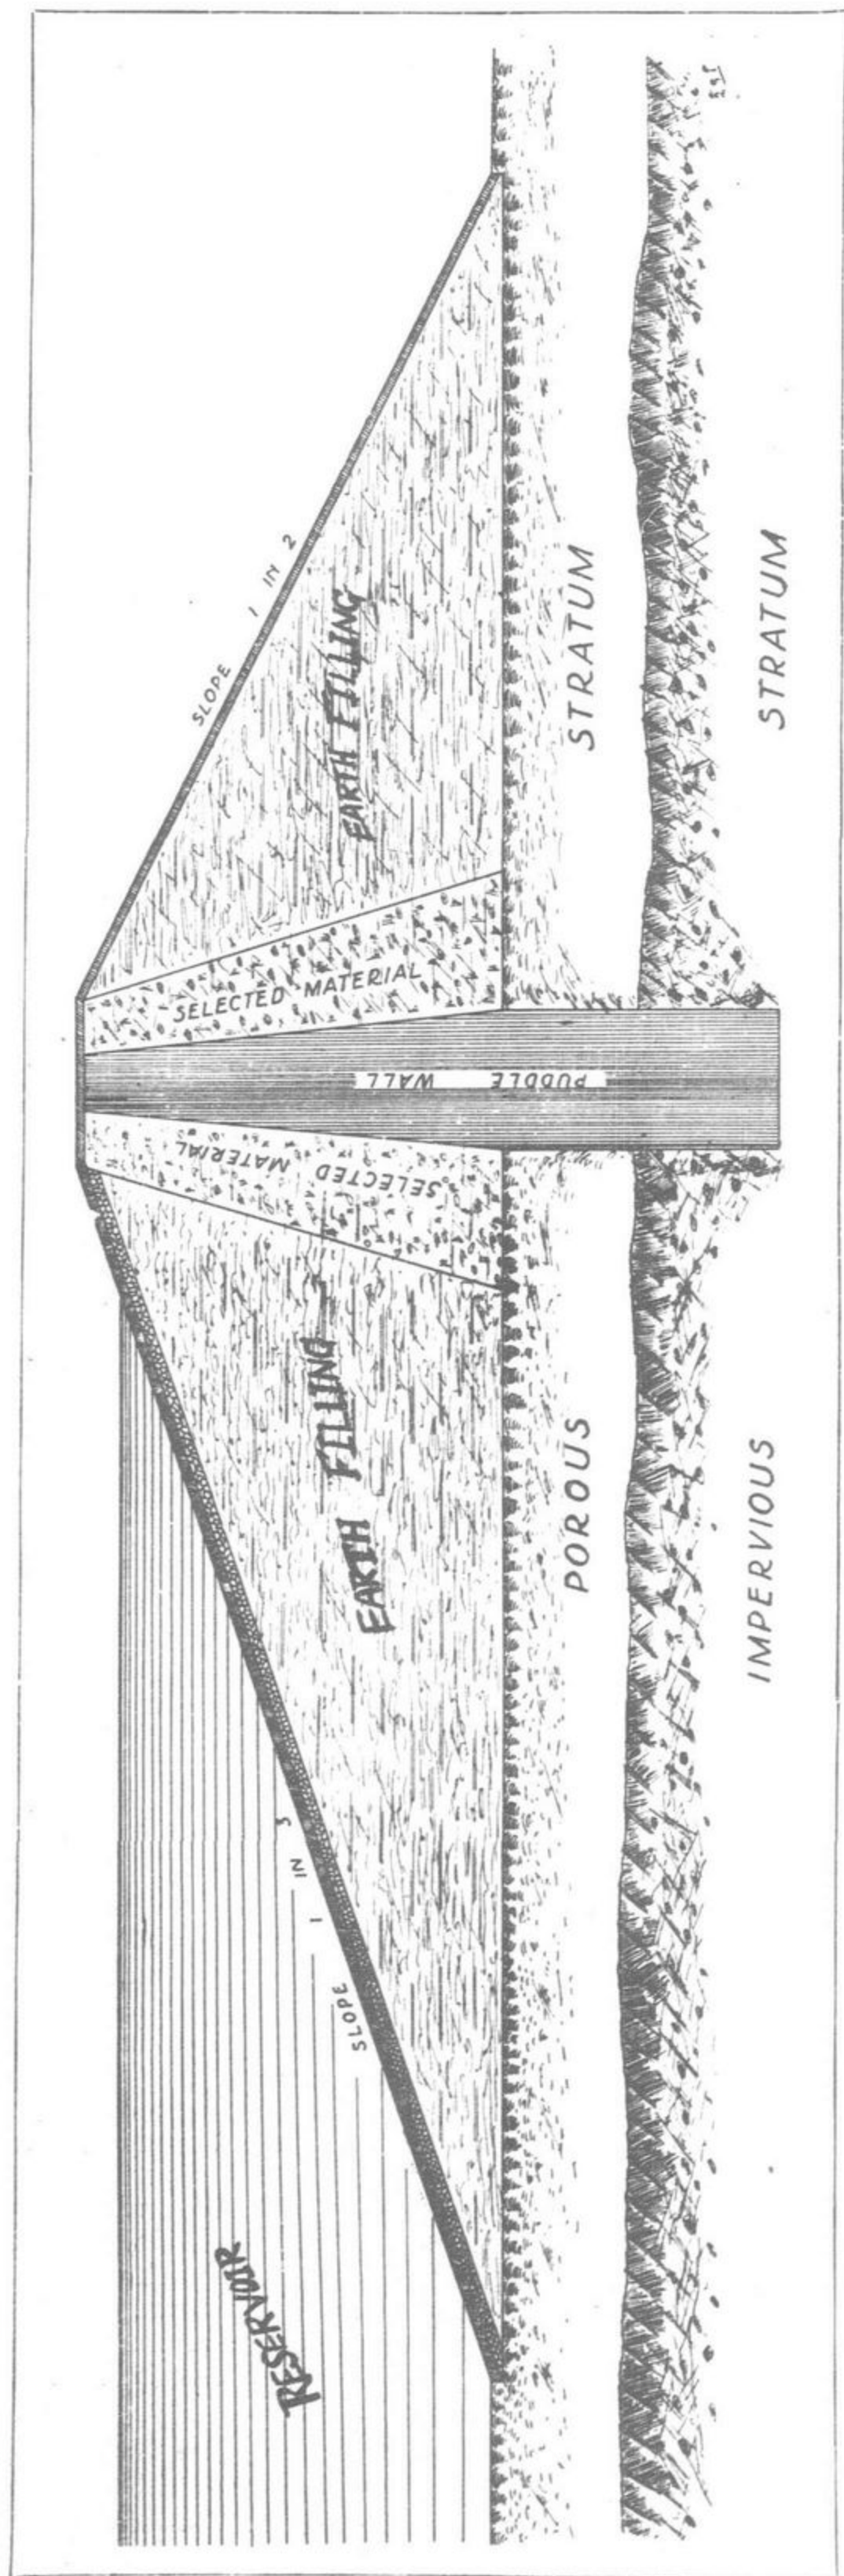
Section of Earthwork Dam. This shows the Central Puddle Wall to prevent leakage of water. Earth filling is a cheap method of construction.
